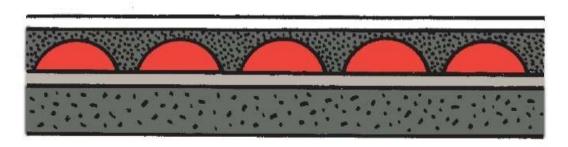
RCC slab + 75mm Inverted earthen pot in lime concrete + 20mm cement mortar finish
